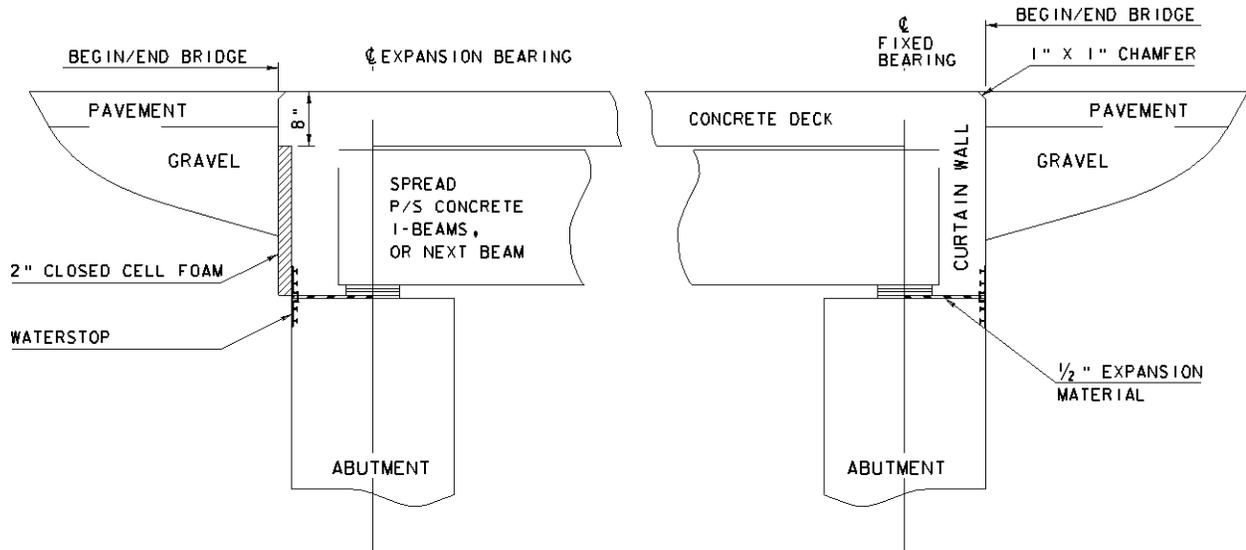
1 North East Bulb Tee (NEBT) Type E Bridge End Detail
